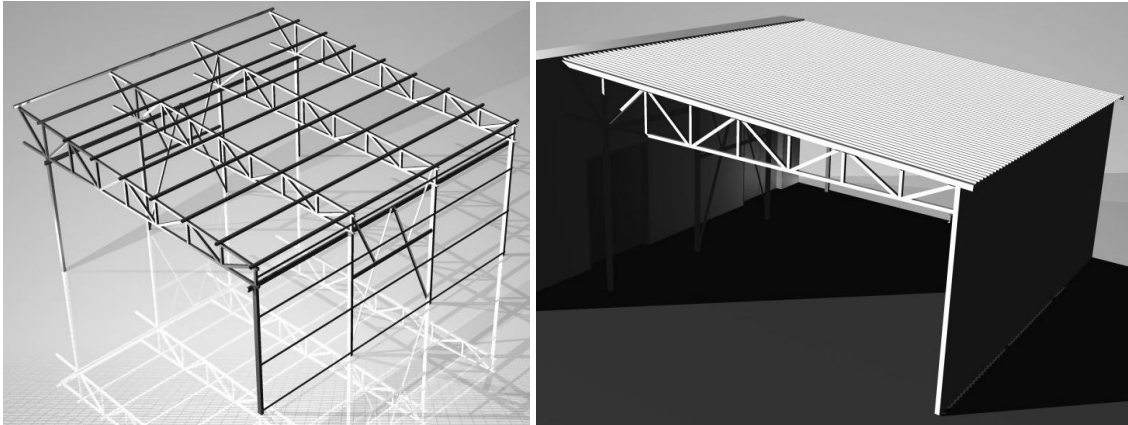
Eave model with the building wall and with side and roof trapezoidal sheet
